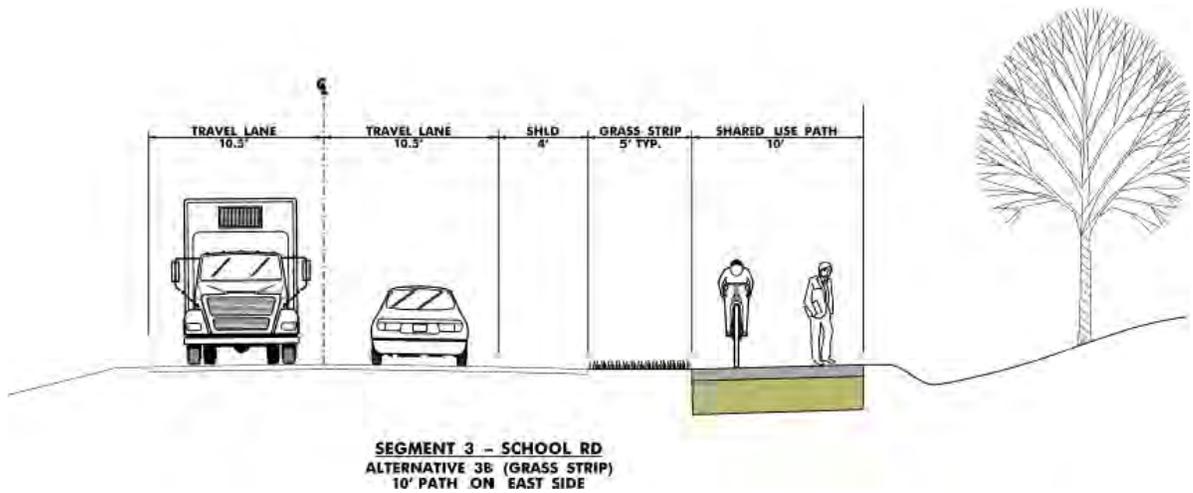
Typical section for 10' asphalt path separated from School Road by 5' grass strip
